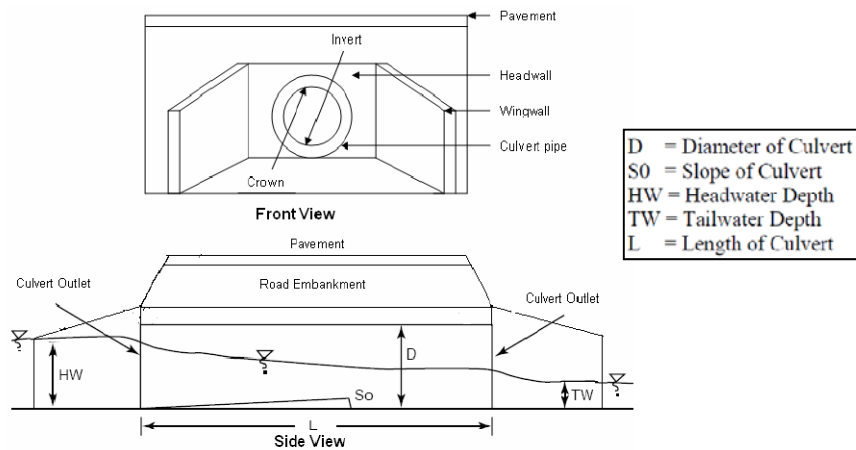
Typical Culvert Components (Najafi, et al, 2008)
